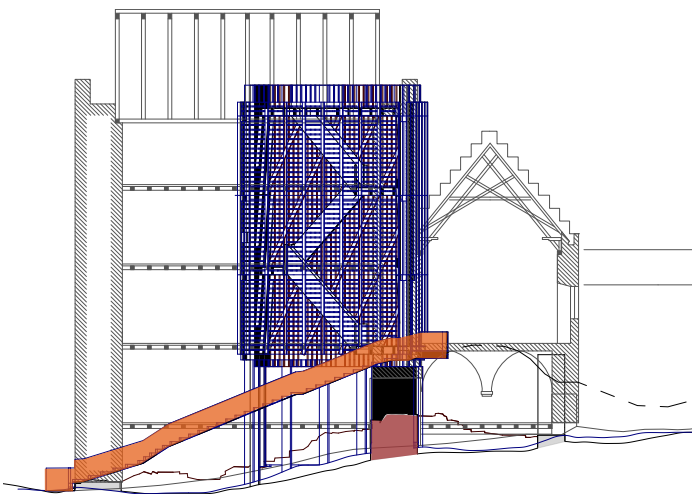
Lookout tower traced elevation 1:400 (A4)
